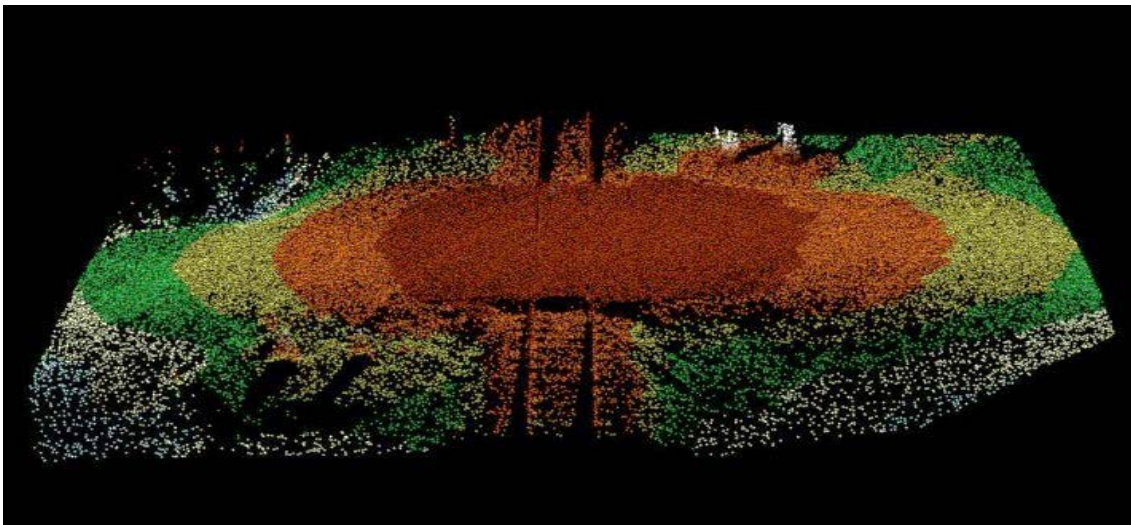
Brannon Road Crossing 3D point cloud. Green to red indicates increasing elevation.
